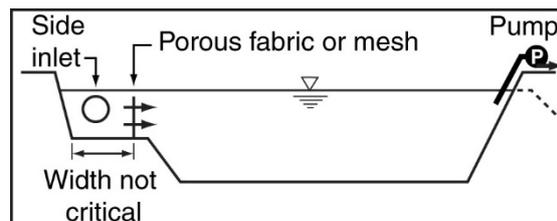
(b) – Typical layout of inlet chamber with side inlet (Type D basin)
